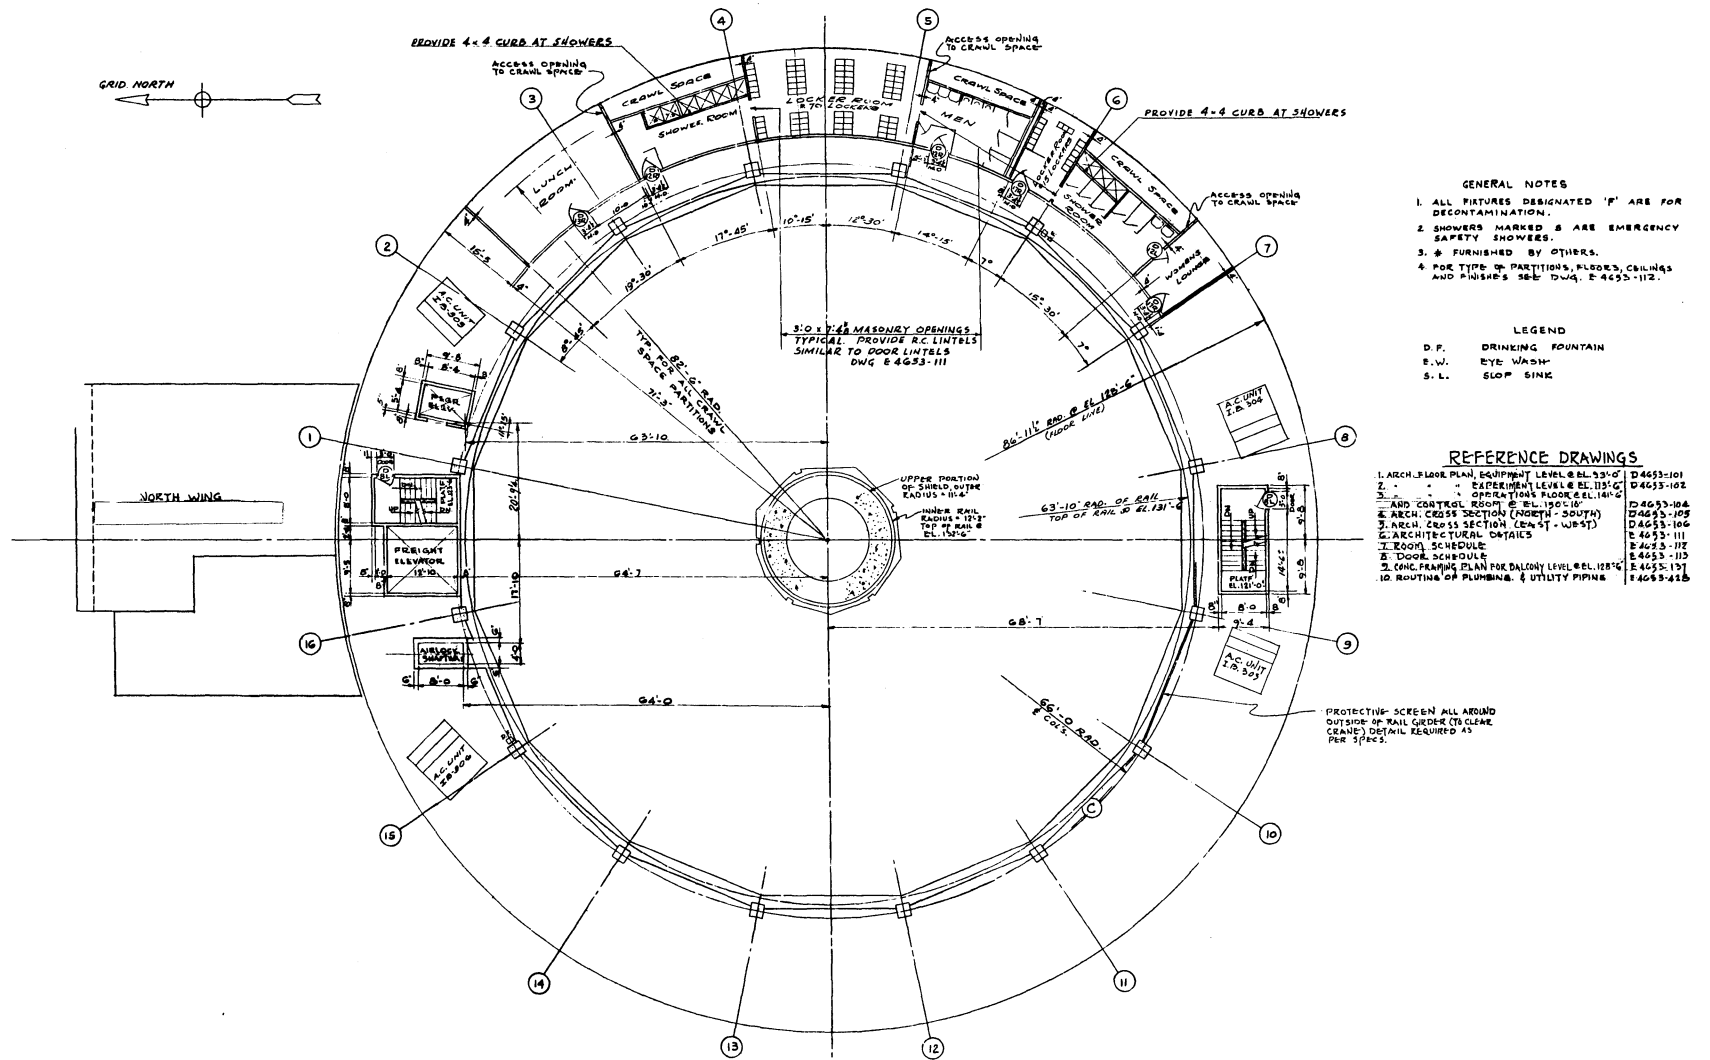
Plan of the balcony level of the HFBR building at elevation 128 ft-6 in.
